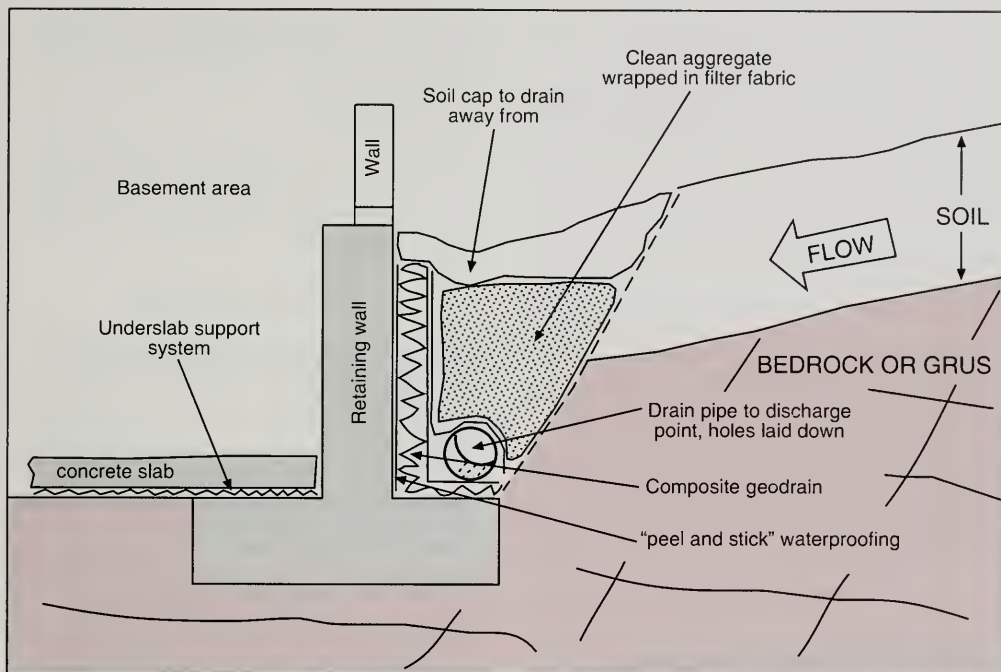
To mitigate basement seeps one can cut back an area suitable for fitting a backdrain, as shown. It is best to wrap the foundation with waterproofing membrane, attach a composite geodrain that is connected to a drain pipe, and extend the drain pipe to exit away from the foundation to keep the area dry.
